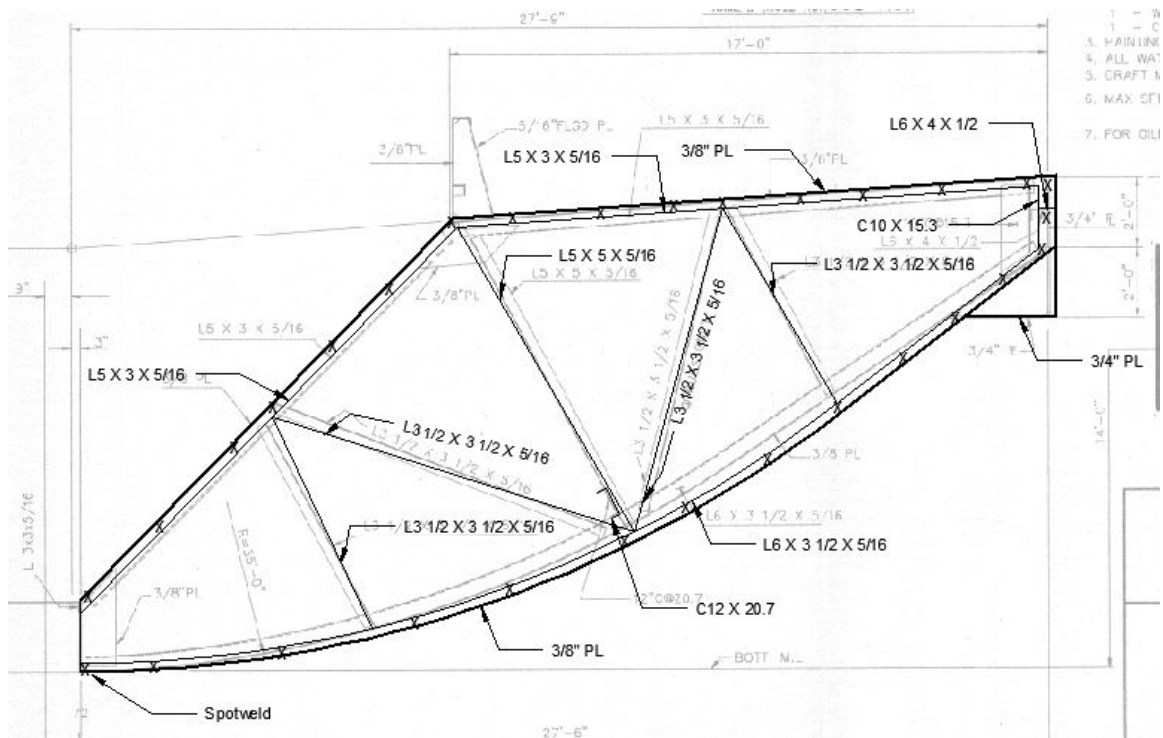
Bow truss structure construction drawing with model geometry overlay
